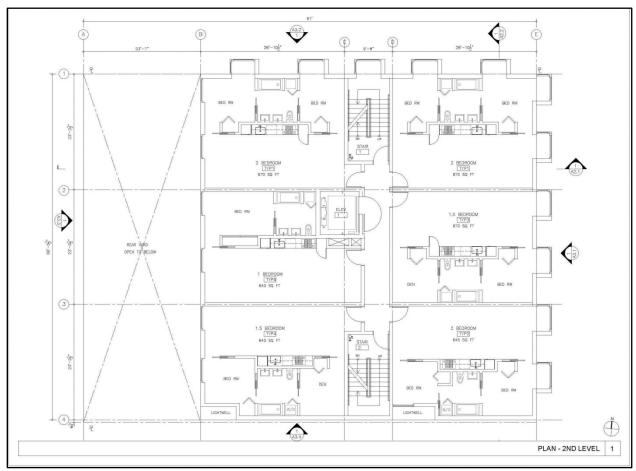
SECOND AND THIRD LEVELS PLAN
